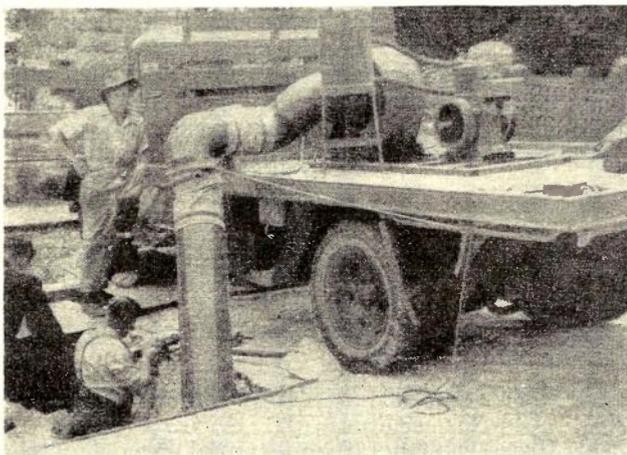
View of Truck-mounted Exhaust Unit working at Under Street Crossing.
